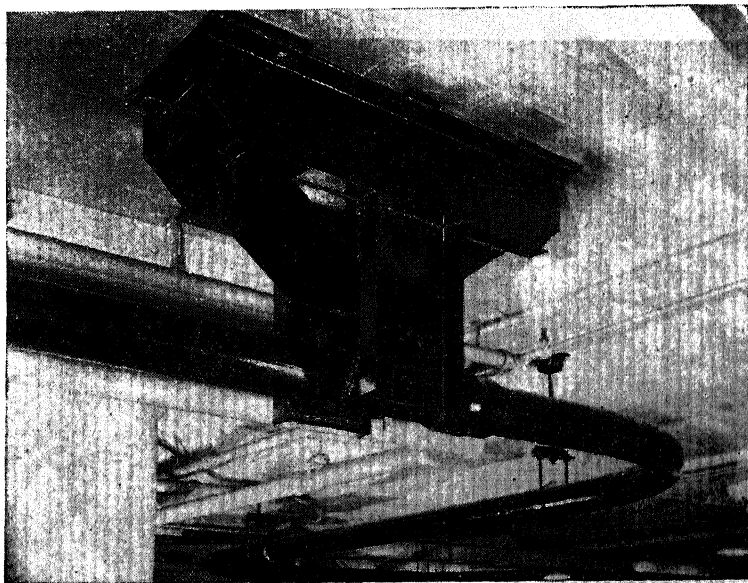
An arc welded anchorage for an arc welded 300-lb. warehouse steam line. Built from channels and shape, cut and assembled on the job. Shows the versatility of arc welding.
